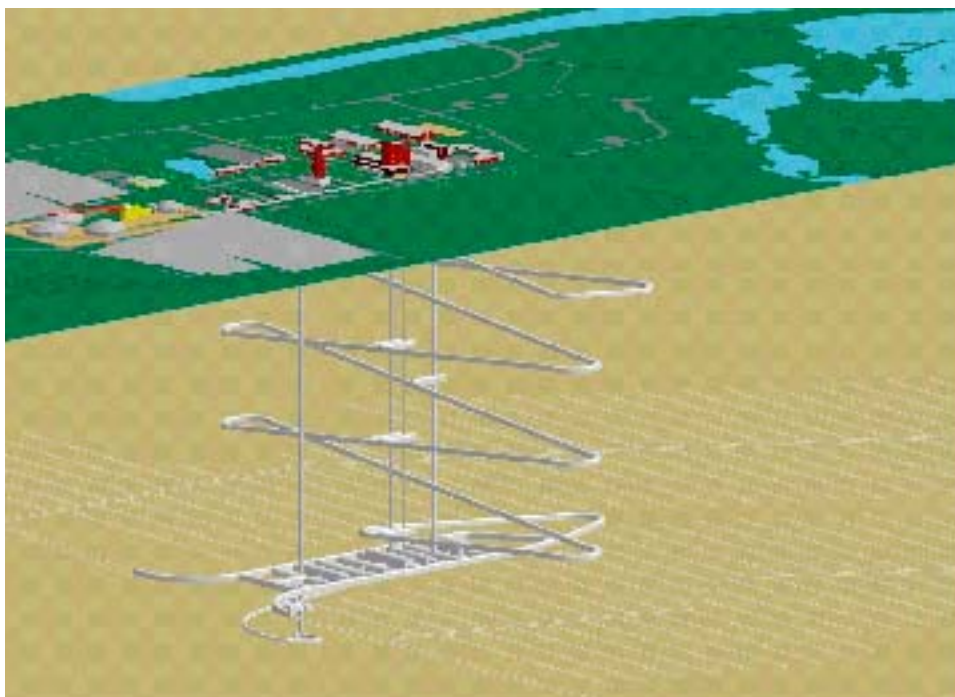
Preliminary layout (February 2005) of access tunnel, shafts and common facilities at repository level.
